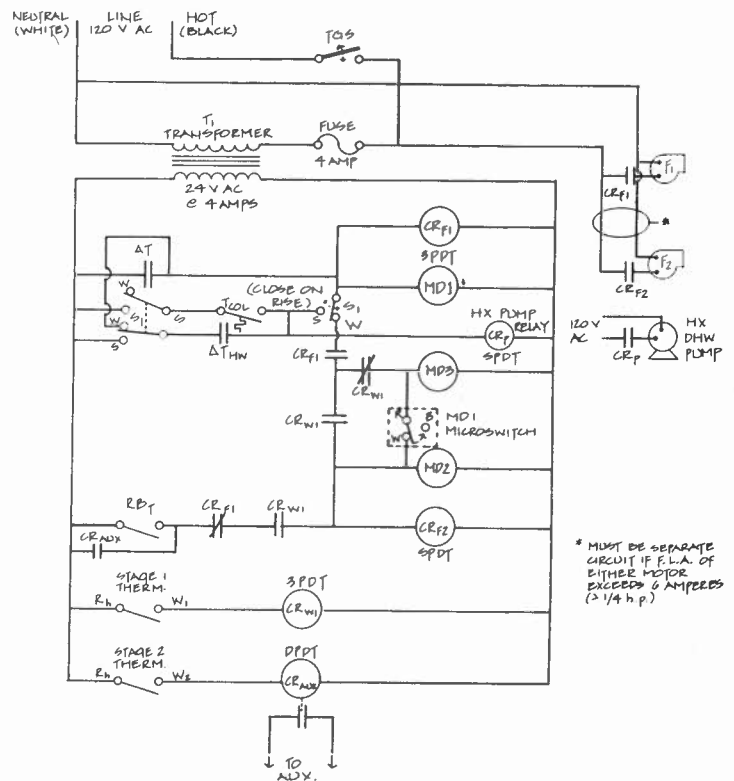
New Construction Wiring Schematic: Series Auxiliary Roof Collector With Storage, DHW and Power Venting
